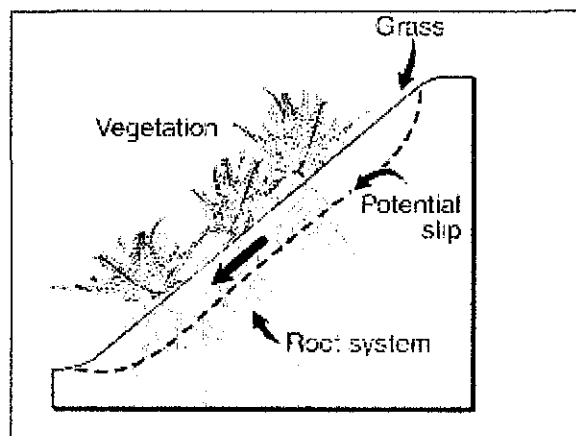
Reinforcement of shallow slope failure (Silva, 1999)
